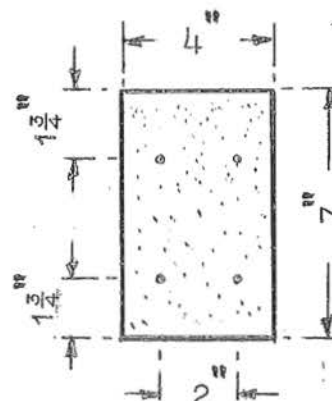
CROSS-SECTION THROUGH BEAMS.
